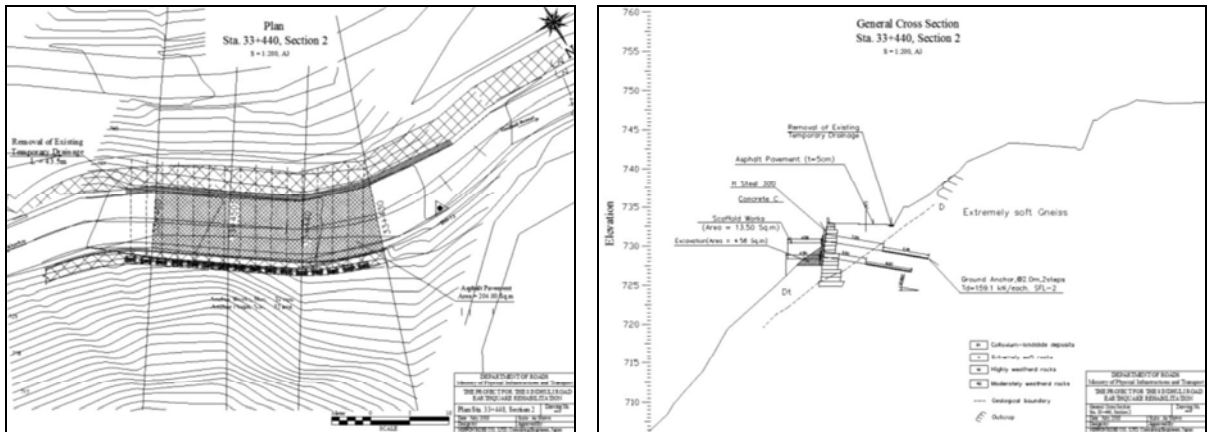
General Plan and Cross Section of the Proposed Countermeasures (Sta. 33+440)
